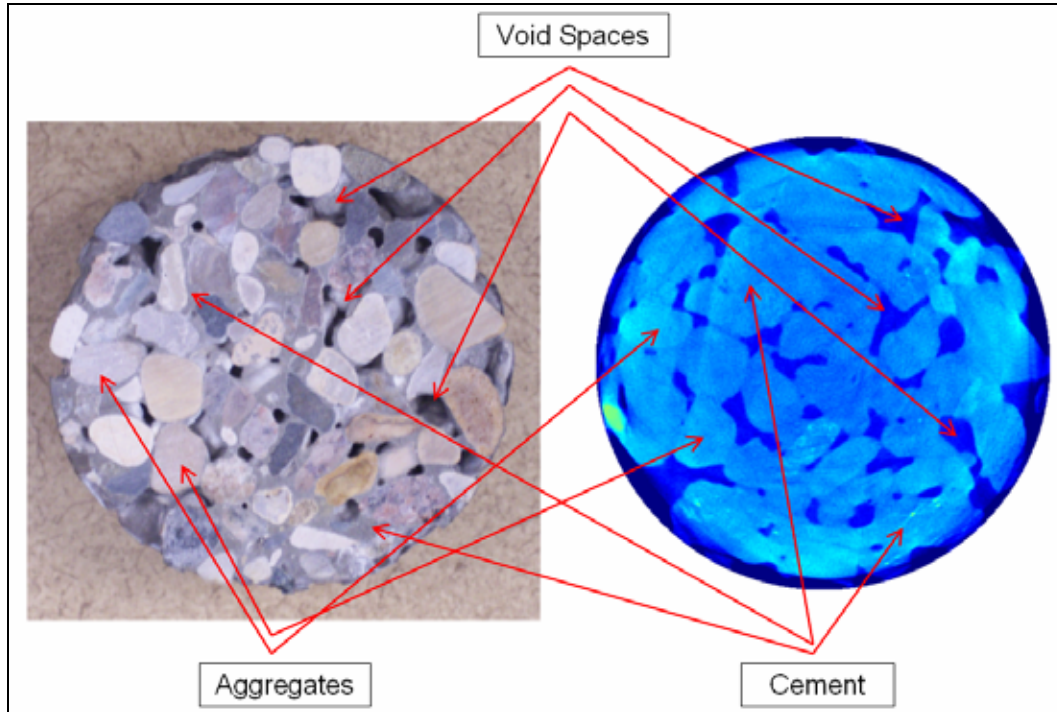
Saw cut surface (left) and CT scan produced surface (right) for the No. 4-RG-S7 specimen
